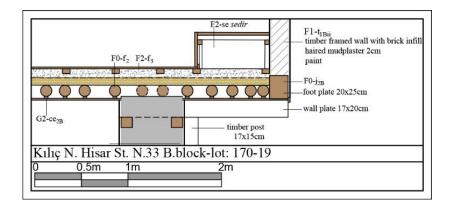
Section drawing of projection supported with a beam and timber post; simple projection, Type1 (Kılıç N. b.block-lot: 170-19)
